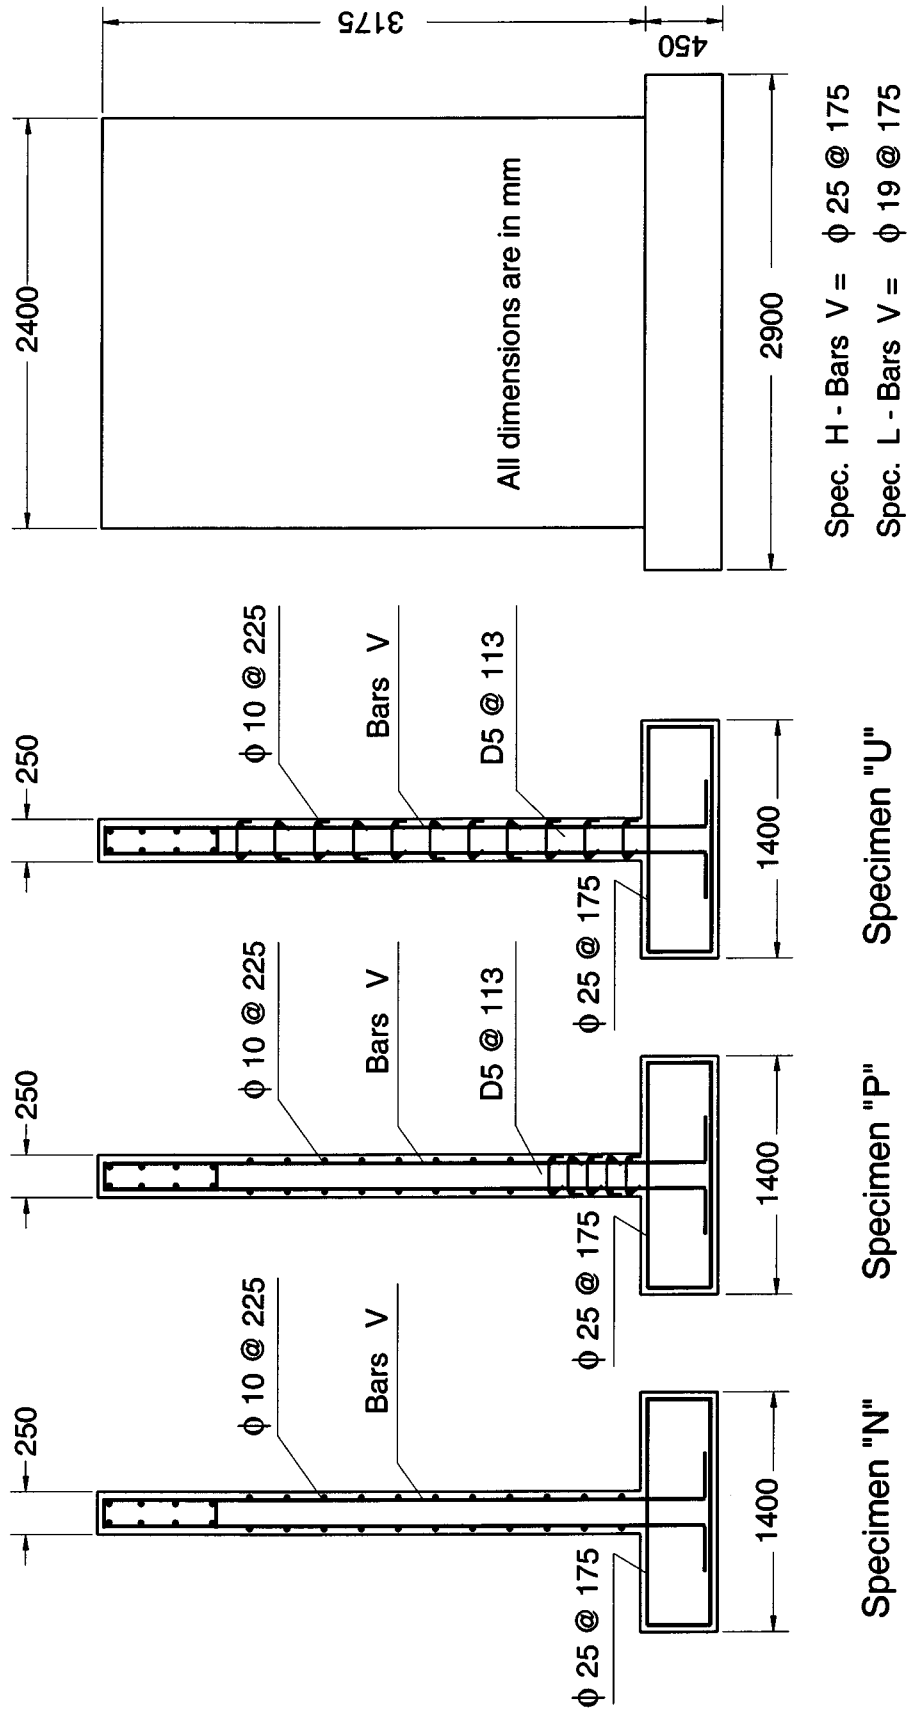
Details of Wall Specimens Tested at UC-Irvine (Reference 9)
